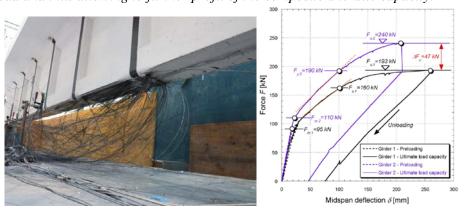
Failure mode of the strengthened girder (left) and measurements of deflection in the reference and the strengthened girder (right) [4]
